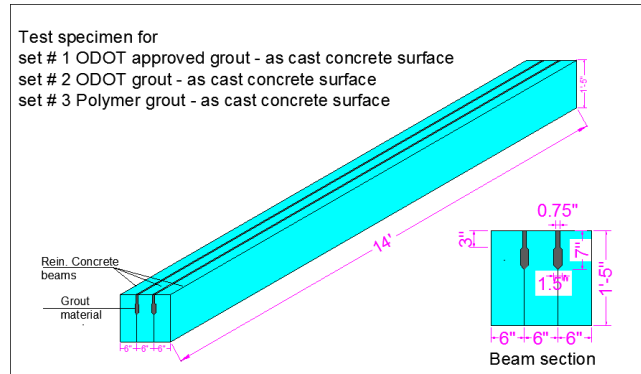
Test Specimen Details for Sets # 1, 2, and 3
